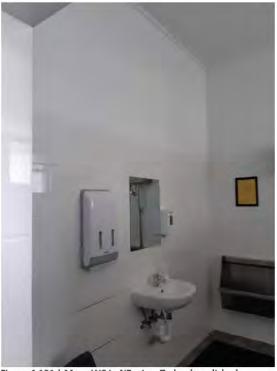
| Mens WC in NE wing. To be demolished including internal walls. Nib walls to be kept at external walls.
